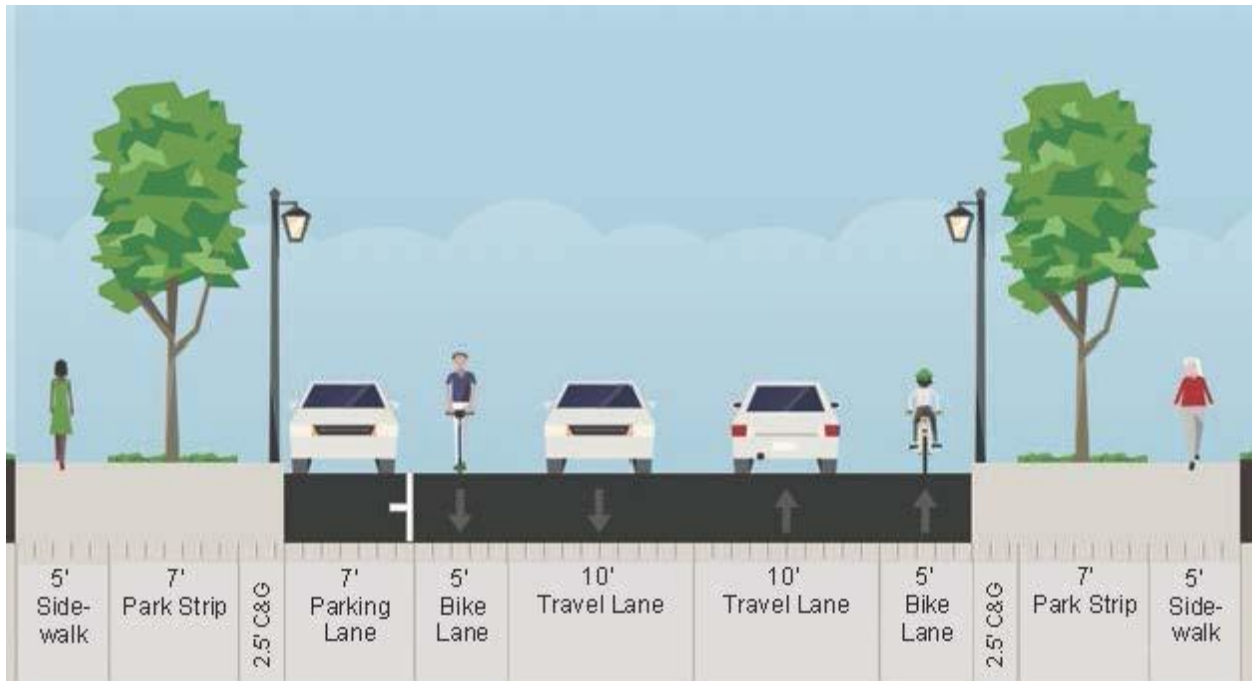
Minor Collector roadway (37ft asphalt) with striped bike lanes – 25mph design.
